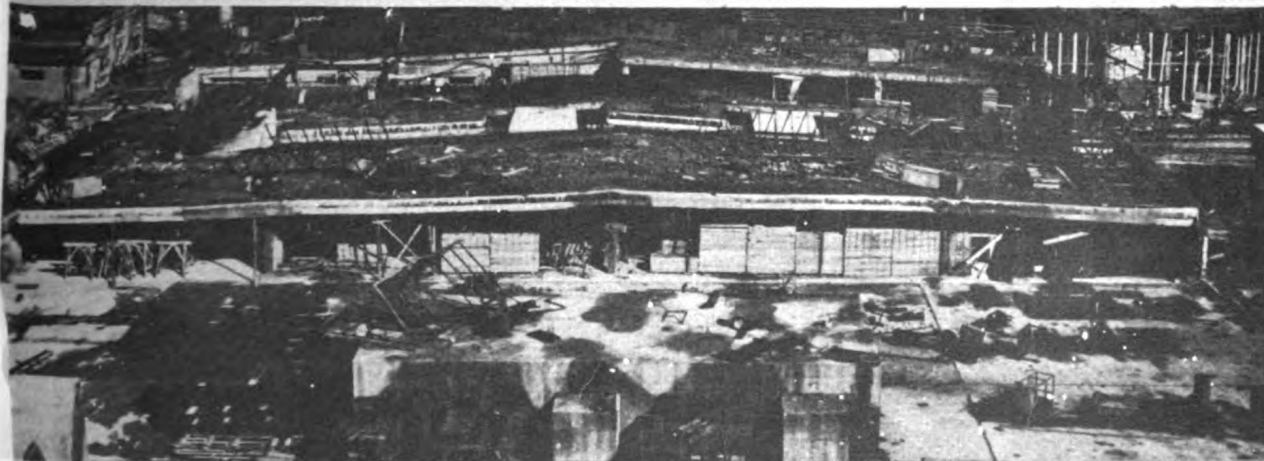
View looking north - Taken from roof of undamaged section of Bldg. R. Note disruptive pattern painting on shafts and material piled about to distract attention.
